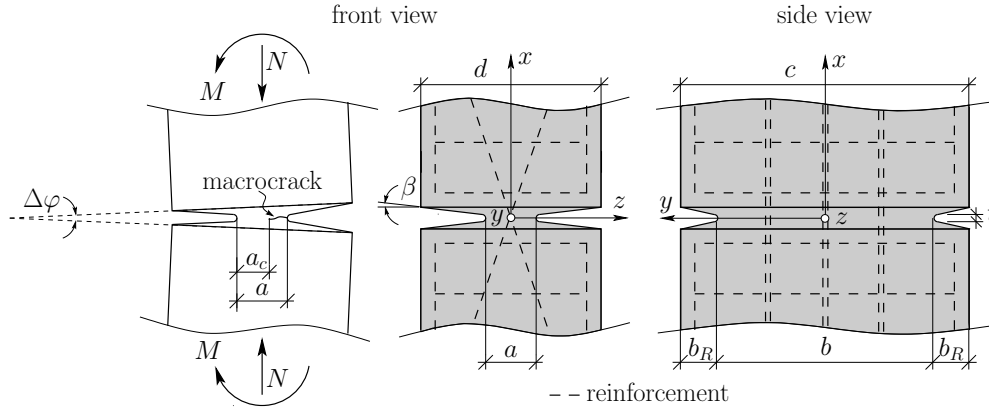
Geometric dimensioning of a concrete hinge with reinforcement crossing at the centerline of the neck; a_c denotes the width of the compressed ligament [5]
